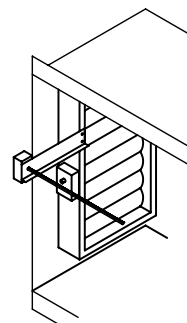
Fasten the supply air sensor installation bracket to the damper flange with #10 x 1/2" tek screws. Locate approximately 1" above the actuator. Verify screw clearance with damper blade linkage. (FläktGroup SEMCO Economizer option only.)
